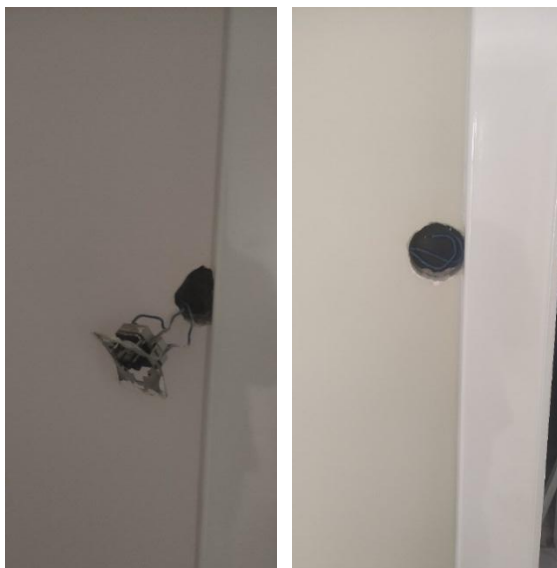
Electrical outlets and switches incompatible with the newly fabricated wide-framed doors
